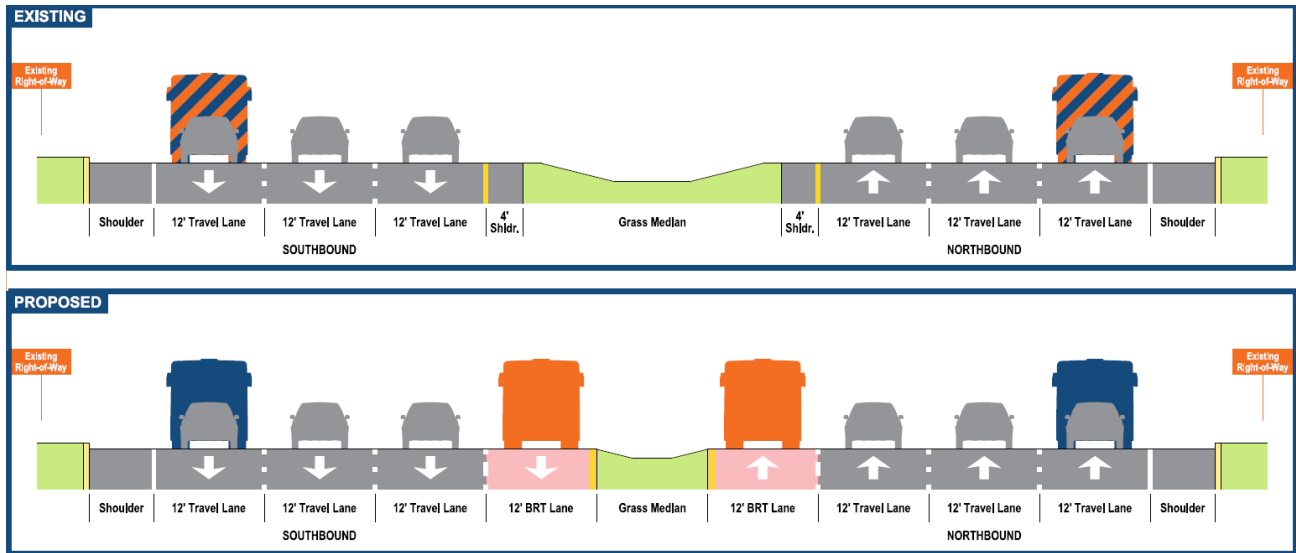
Existing/Proposed Controlled Major Highway Cross-Section
